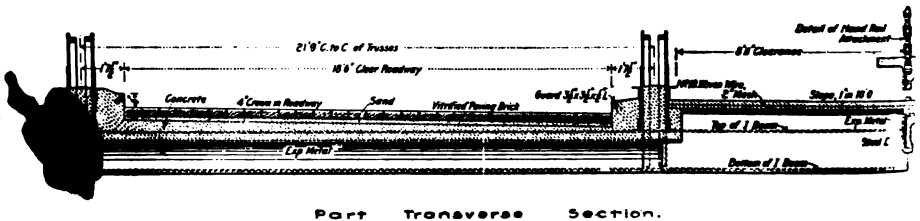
Highway Bridge Floor, Chicago & Northwestern Ry.
